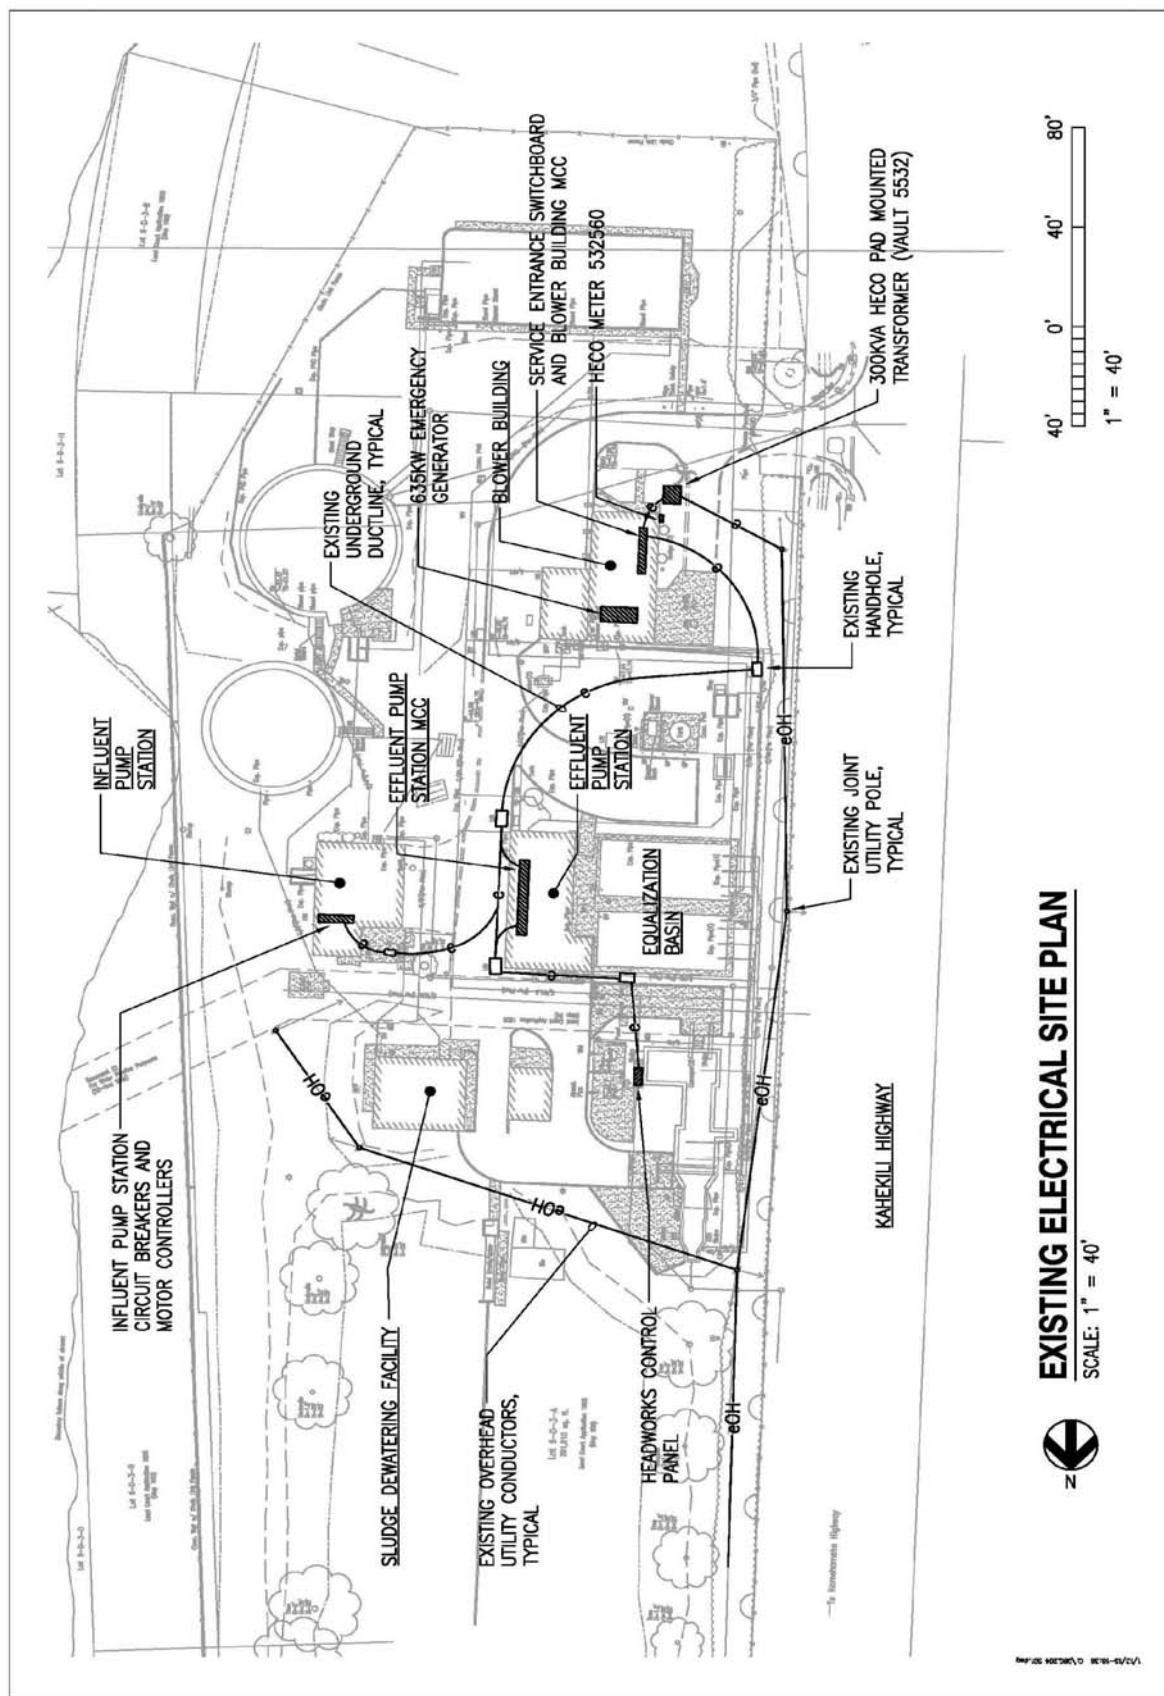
Ahuimanu WWPTF Existing Electrical Site Plan
